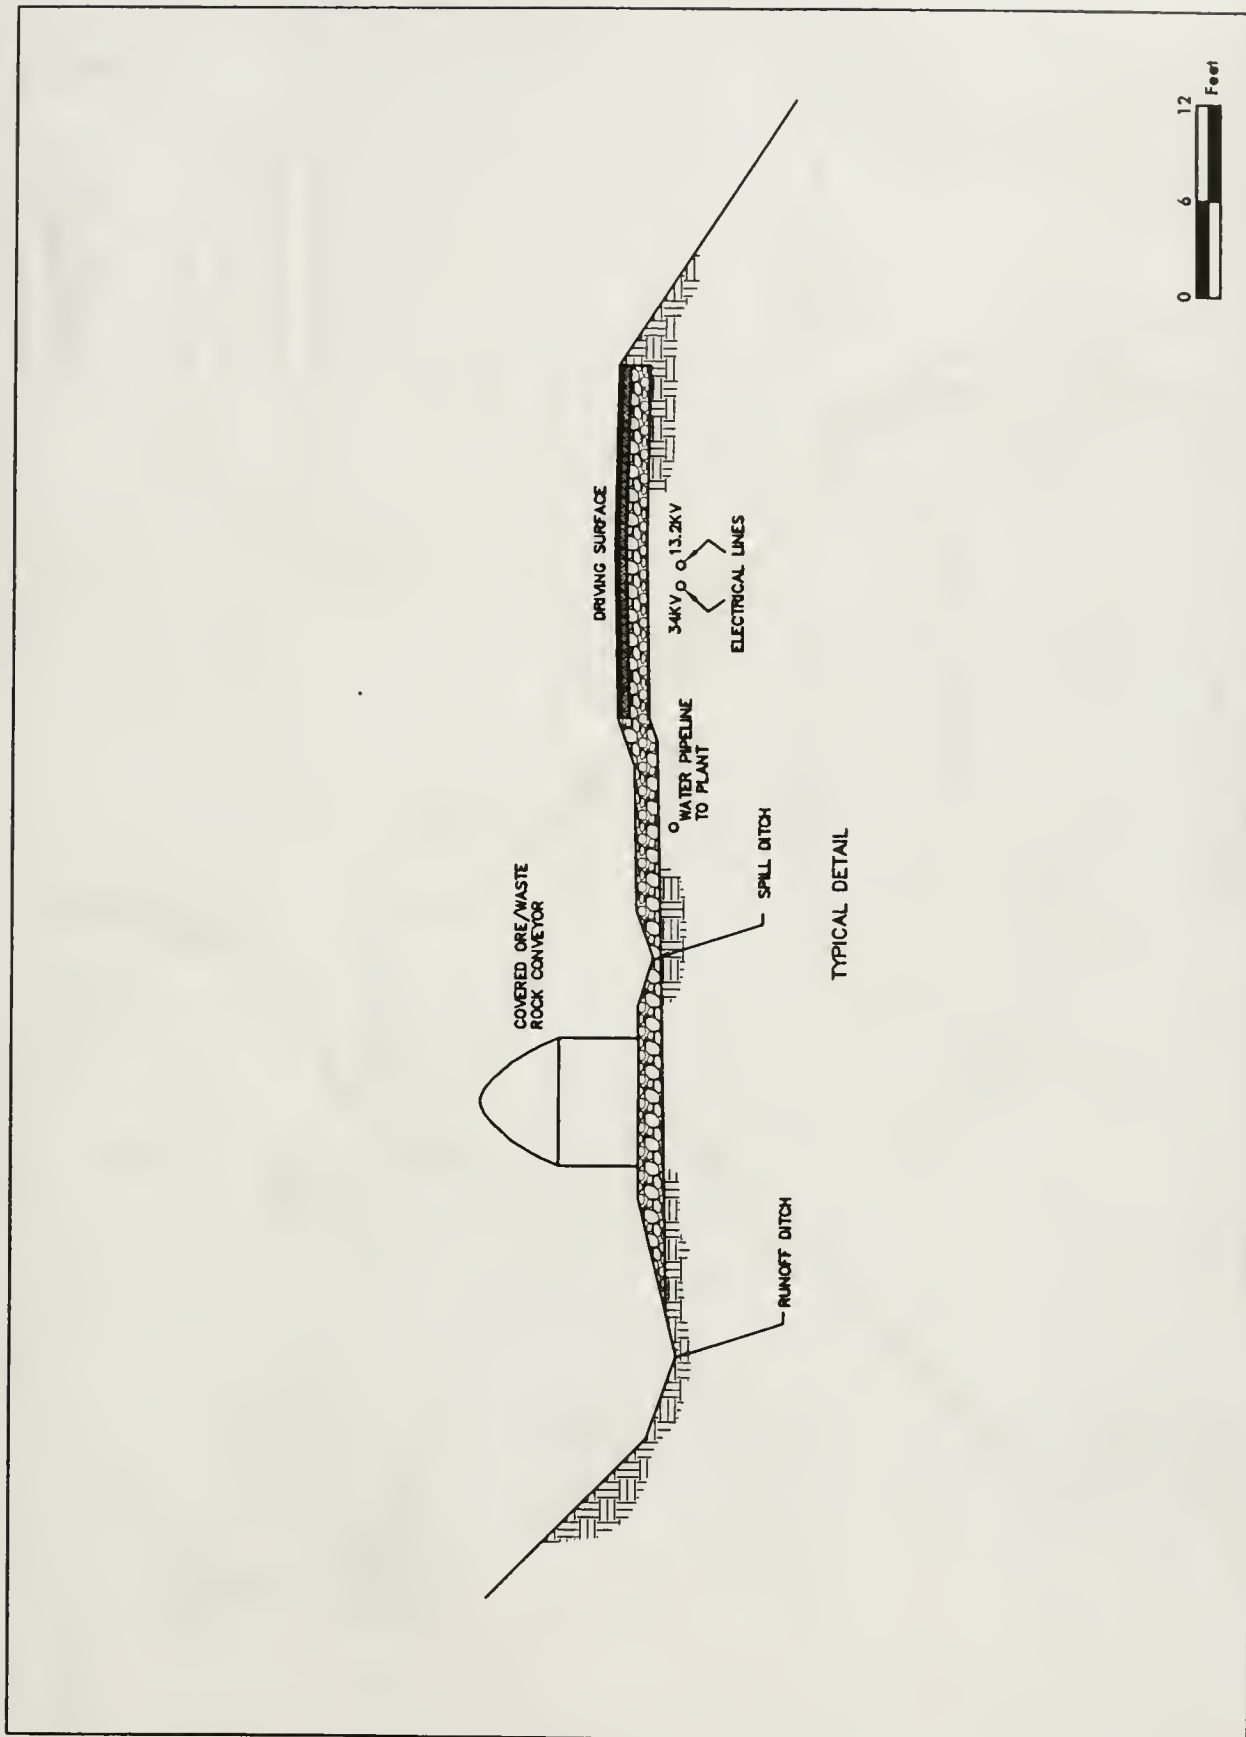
Detail of Overland Conveyor and Libby Adit Access Road, Alternatives 3 and 4
